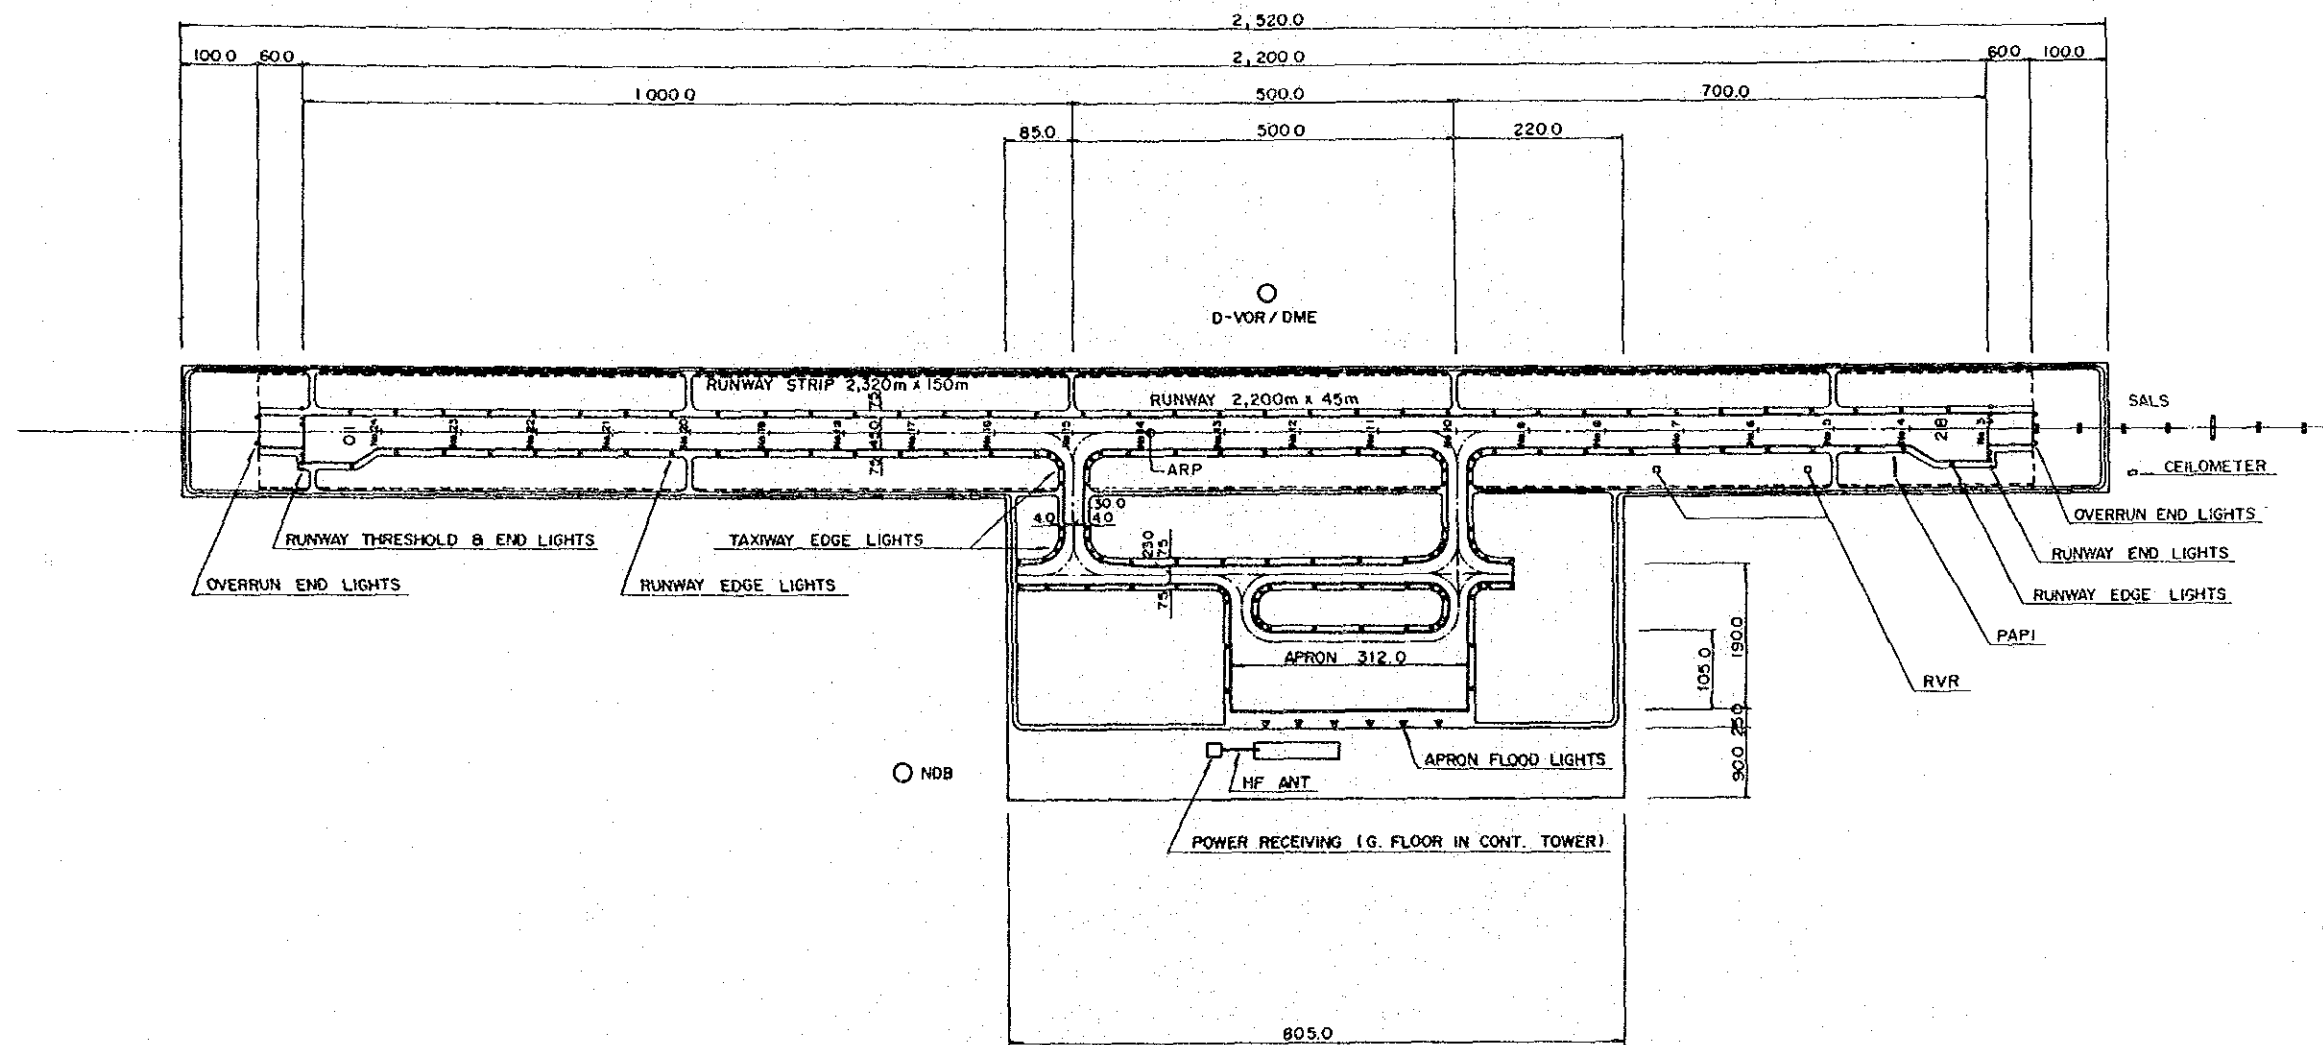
Proposed Navaids Plan for Short Term Development
